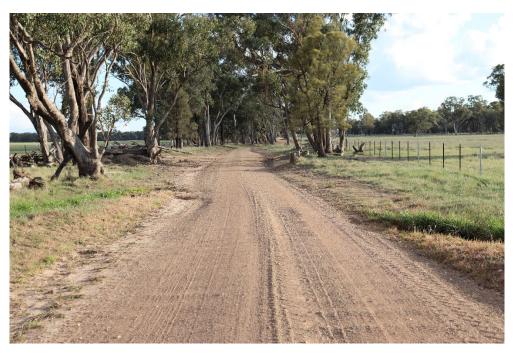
Newsomes Road – Roadside Hazard CH1.0km (Looking west)
